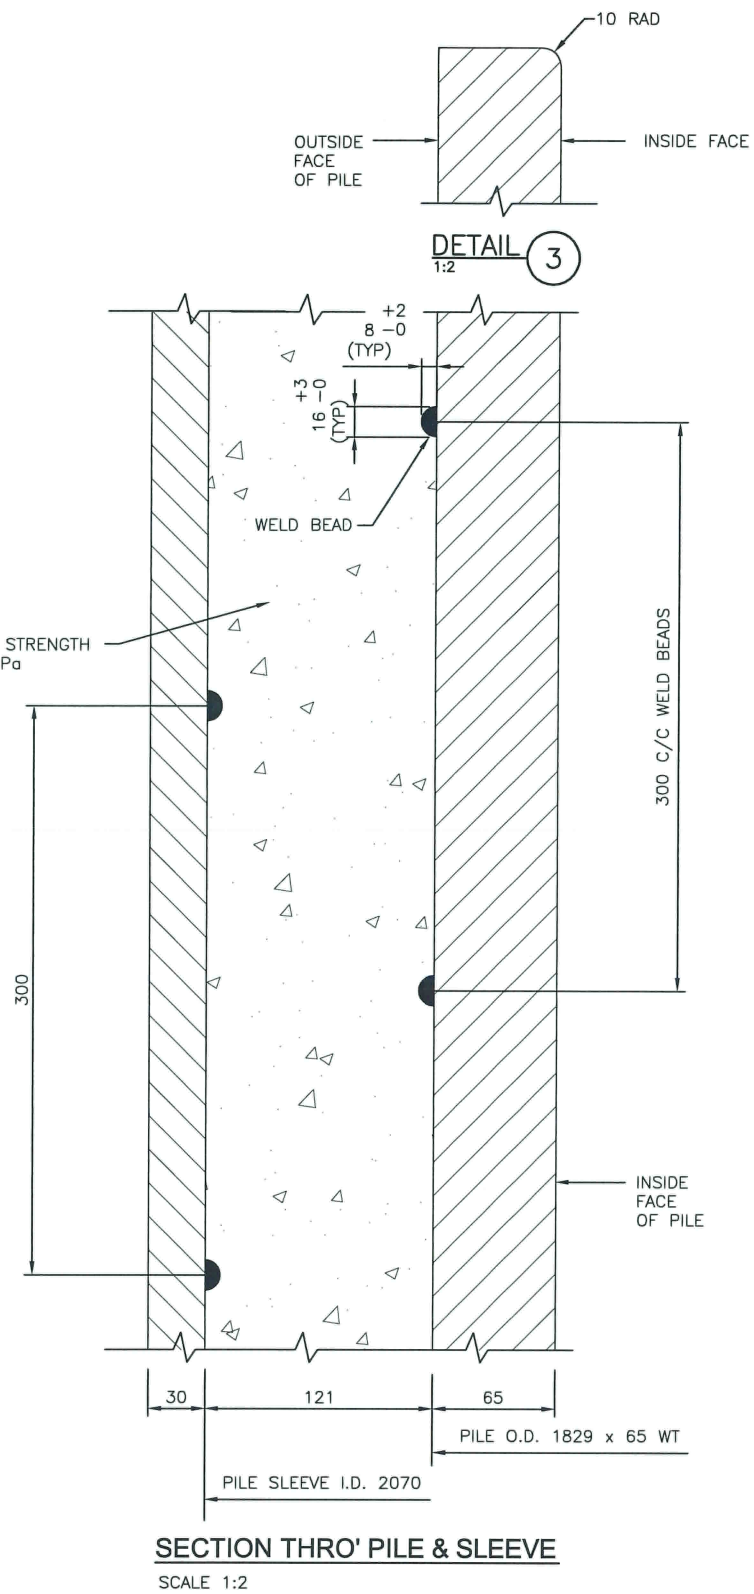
DETAIL OF WELD BEAD SEPARATION REQUIREMENTS
